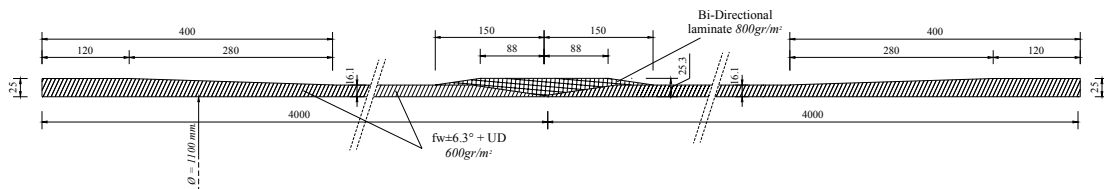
Cross-section of the monolithic tower and winding lay-up.
